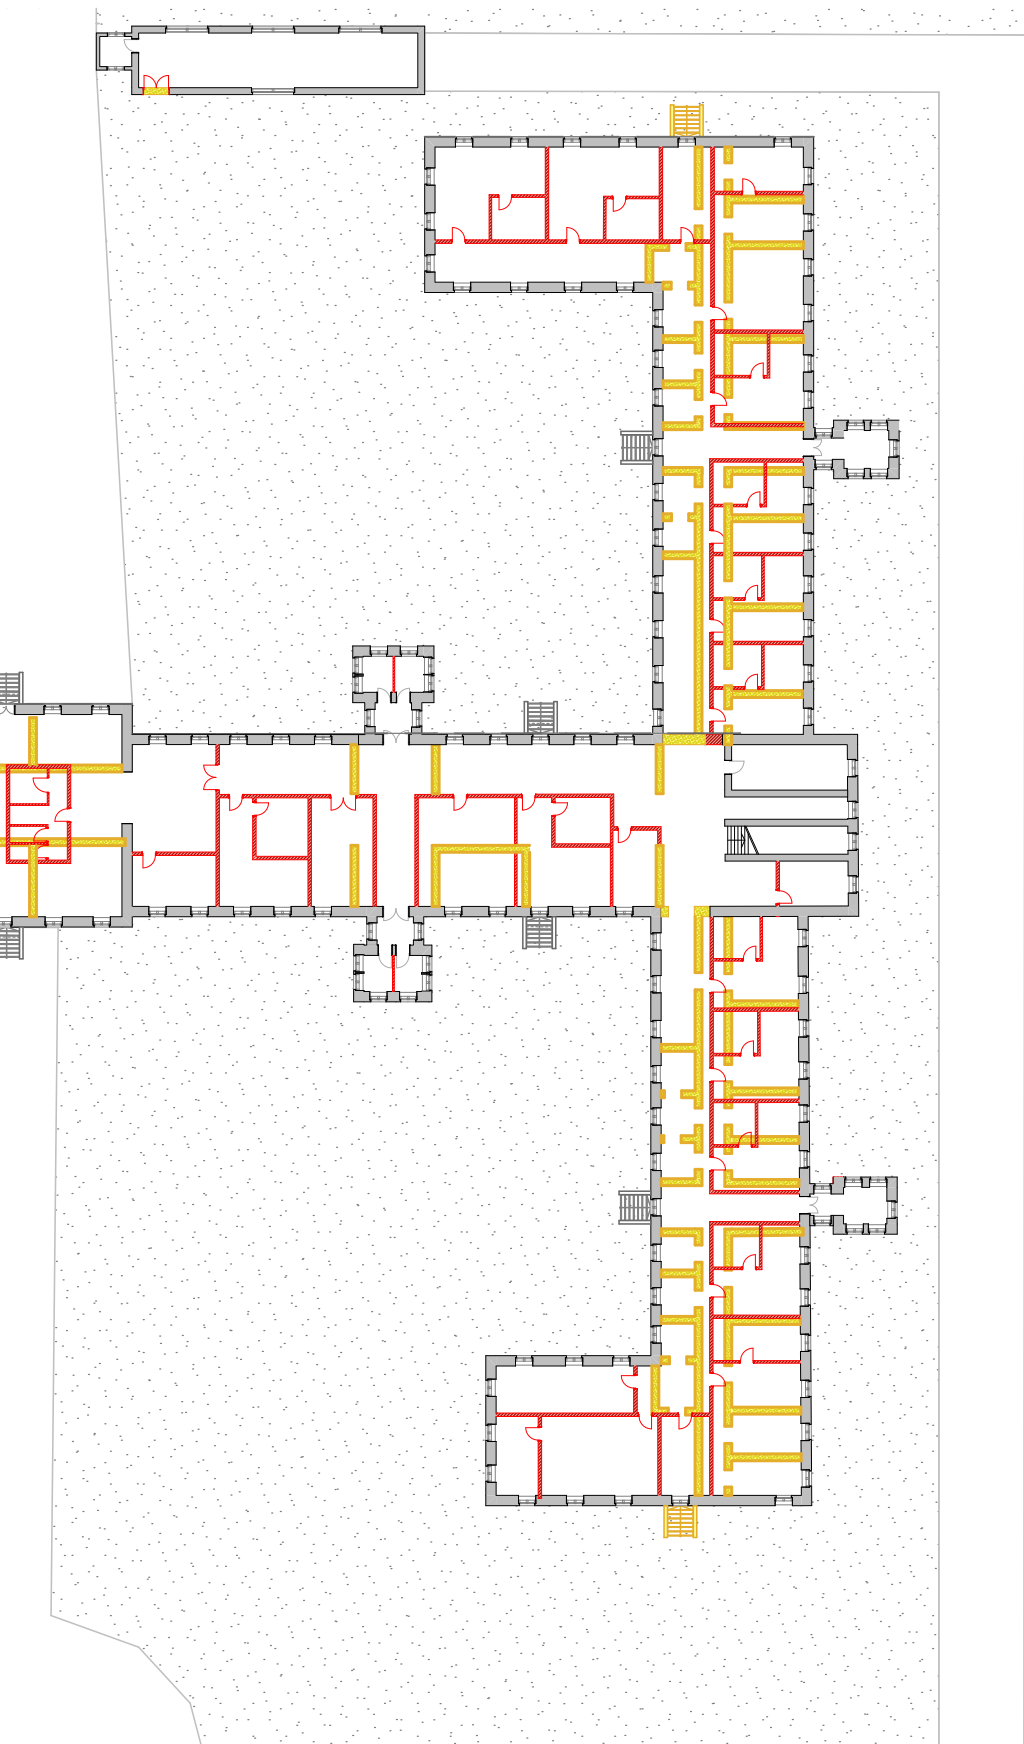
Ground floor plan of the Morselli Pavilion demolition and construction.
